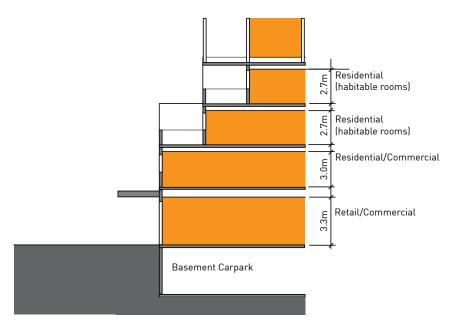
C.13-2: Internal ceiling height requirements for mixed use buildings.
